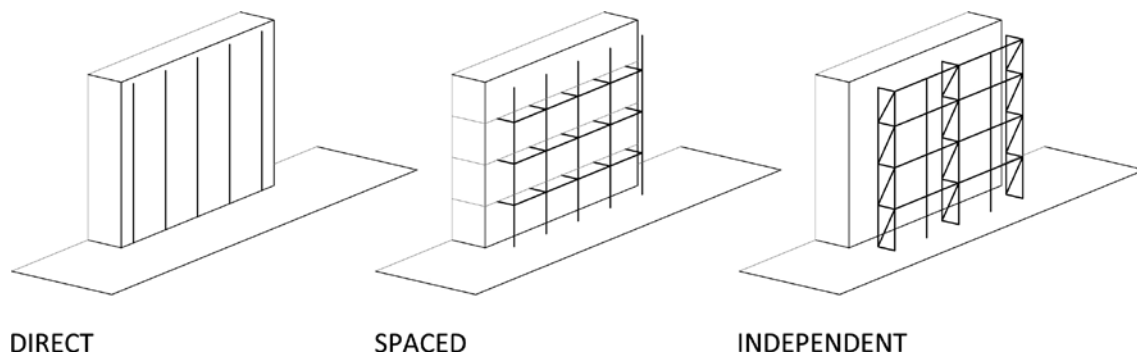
Self-supporting structures for outside sheet of a facade
